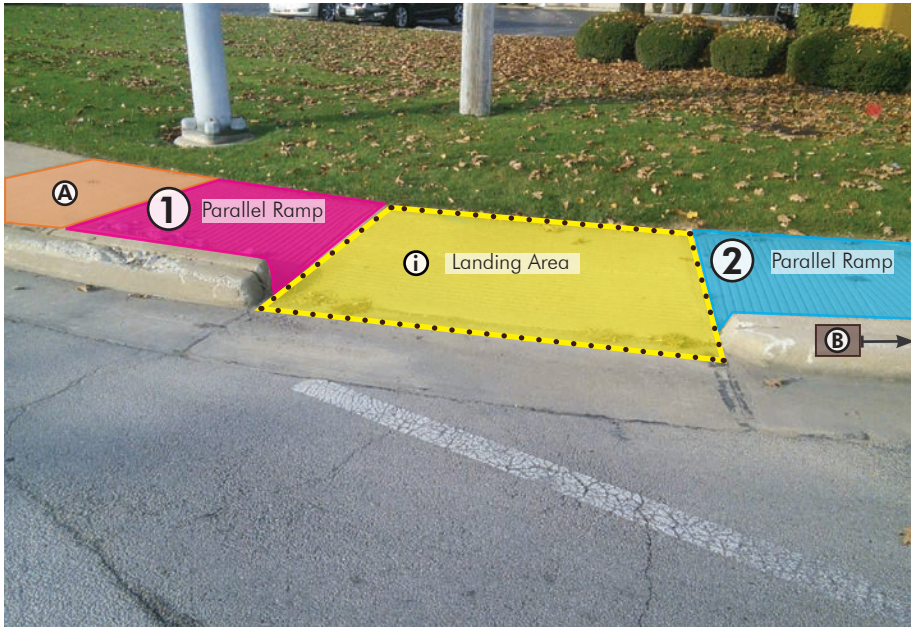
Facing Parallel Ramps with a Sloped Landing
